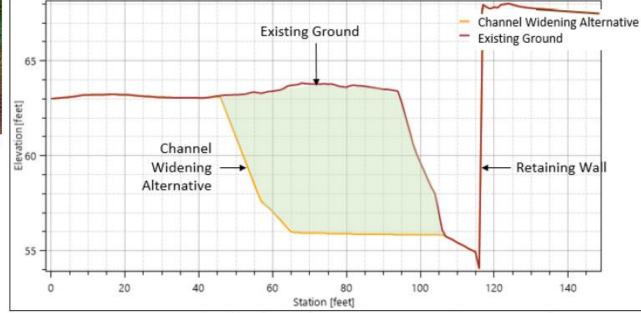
Cross section of Bank Widening Alternative. See Figure 20 for cross section location.
